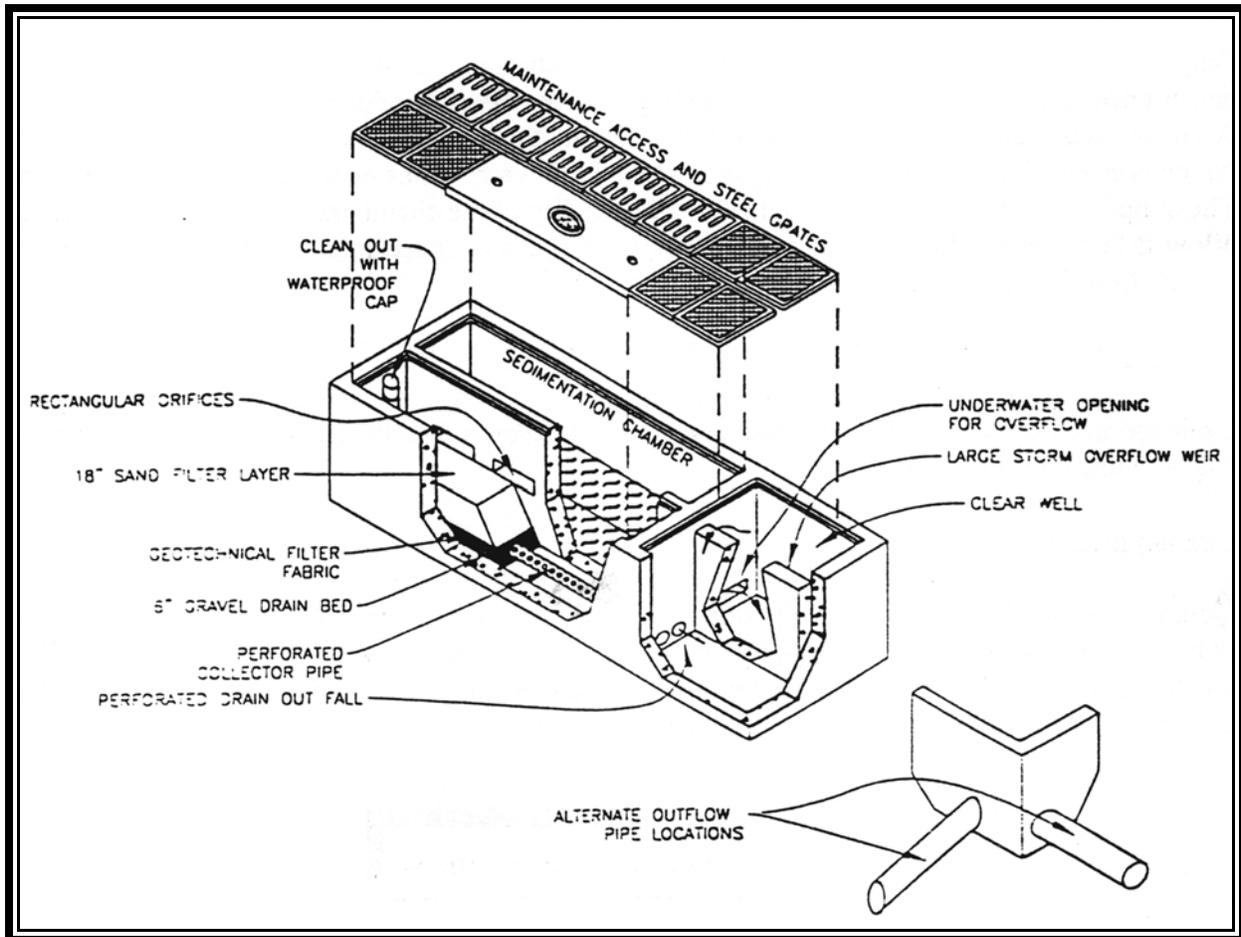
B-1 shows a schematic drawing of the Delaware Sand Filter as used in Virginia. The system consists of two parallel concrete trenches connected by close-spaced wide notches in the wall dividing the trenches. The trench adjacent to the site being served is the sedimentation chamber. When accepting sheet flow, it is fitted with a grated cover. Concentrated stormwater may also be conveyed to the chamber in enclosed storm drain pipes. The second chamber, which contains the sand filter, is always fitted with a solid cover.
